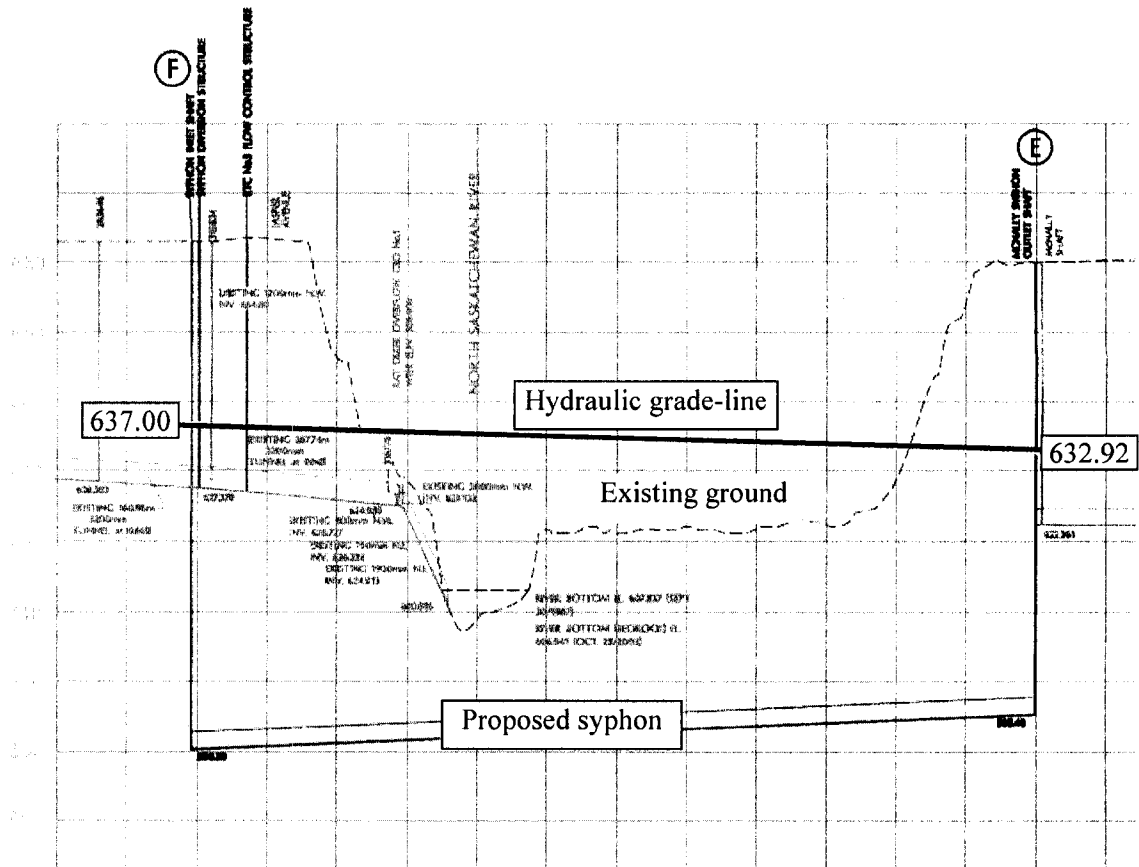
Hydraulic grade-line of proposed tunnel (Preliminary design report of the W12 project, 2005)
